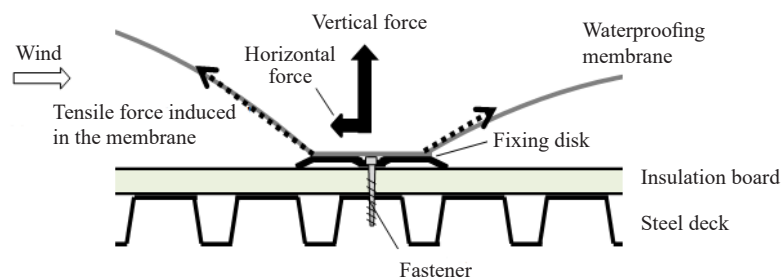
Deformation of waterproofing membrane and forces acting on the fastener
